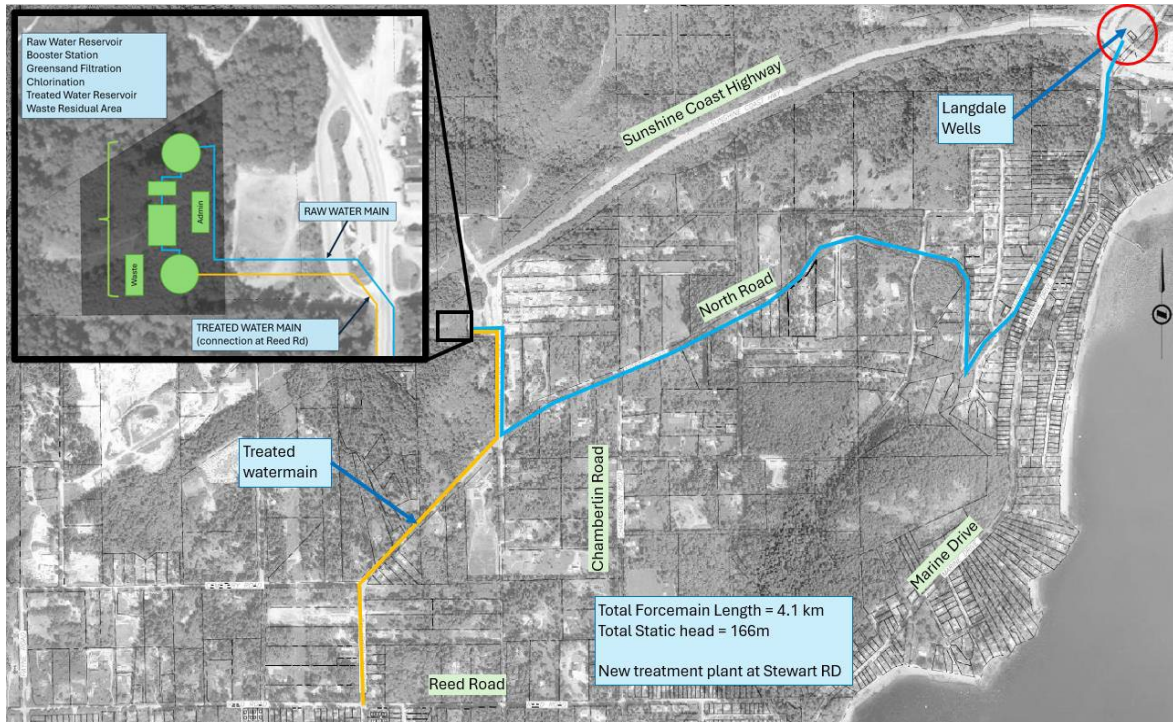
Alternative 5 - T-2 Langdale to Stewart Rd Plant via North Rd
